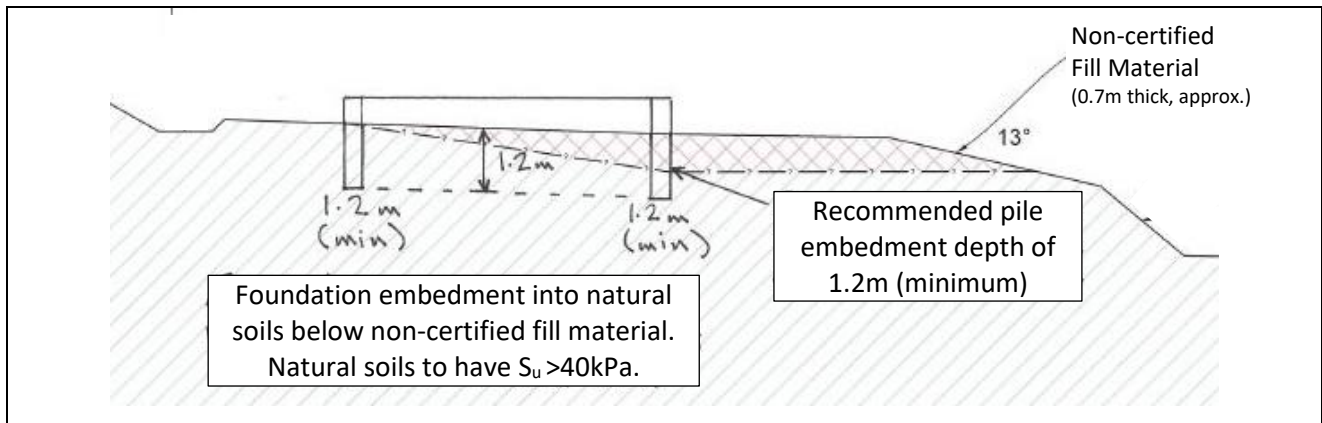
Potential extent of fill below proposed footprint. Foundations to be embedded below fill material.
